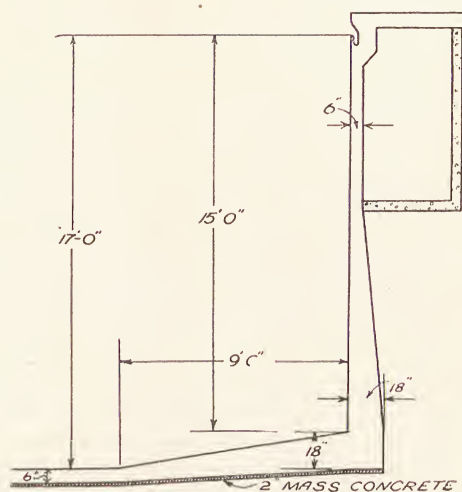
REINFORCED-CONCRETE WALL TO DEEP END OF MODERN BATH
